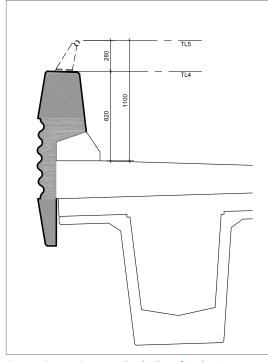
Concept sketch of future bridge separation at Whau River (View 3)
